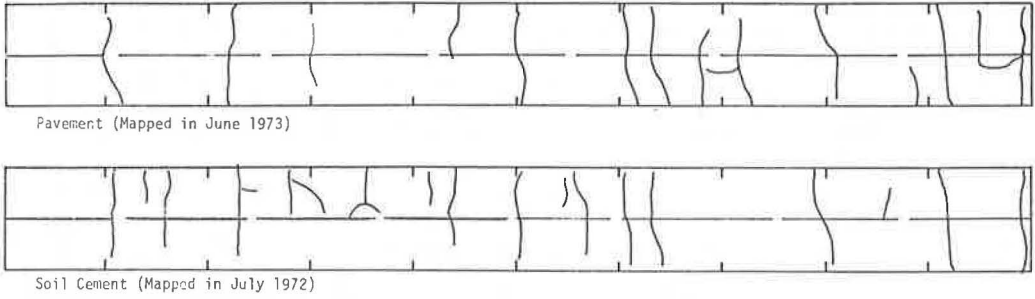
Cracking pattern of soil-cement base and superimposed pavement for experimental section with lime additive (two mixings).
